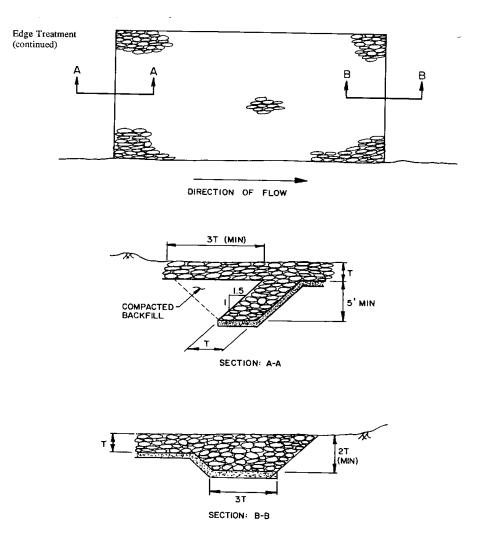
Typical Riprap Installation: Plan And Flank Details
